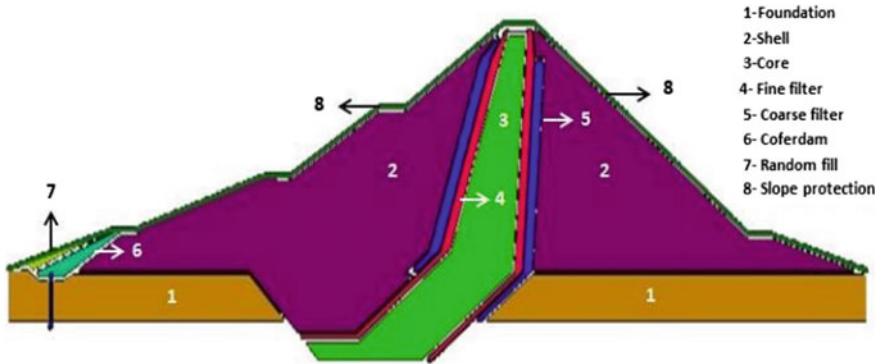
Typical cross-section of Hamrin earth dam [14]
